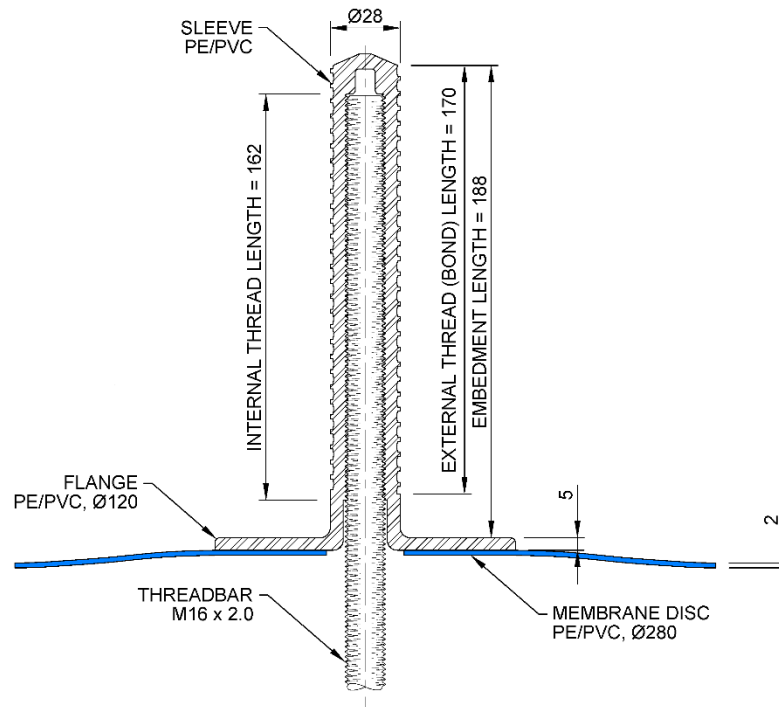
Sectional elevation of a BA anchor used on the CRR project.
